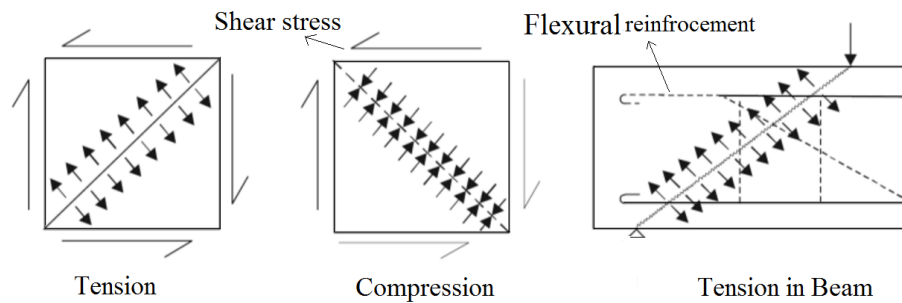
Diagonal tension and compression stresses acting on a section of a beam as a result of internal shear stress (Varghese 2008)
